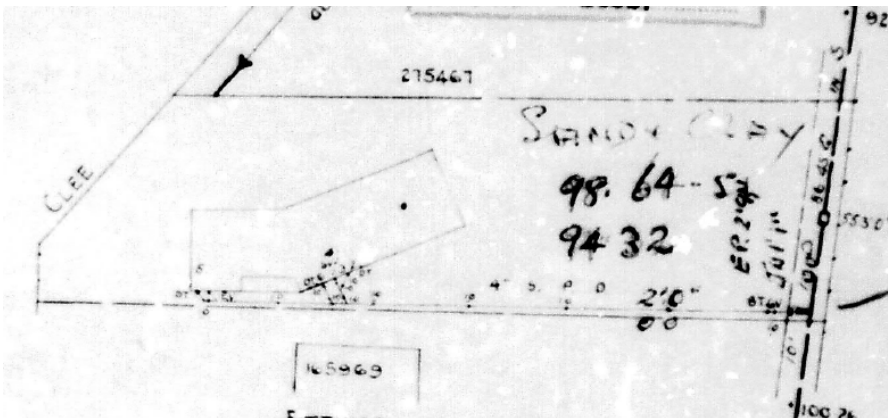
Footprint of the house, dated July 1957, annotated with sewerage works (Source: Plan of Drainage No. 292608).
